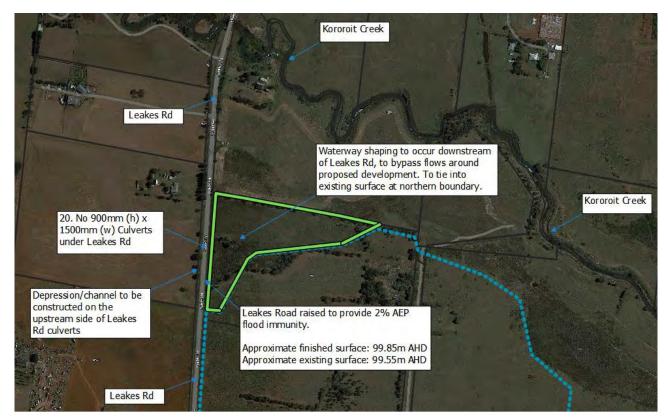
Proposed Conditions Layout (Spiire, Feb 2023)
